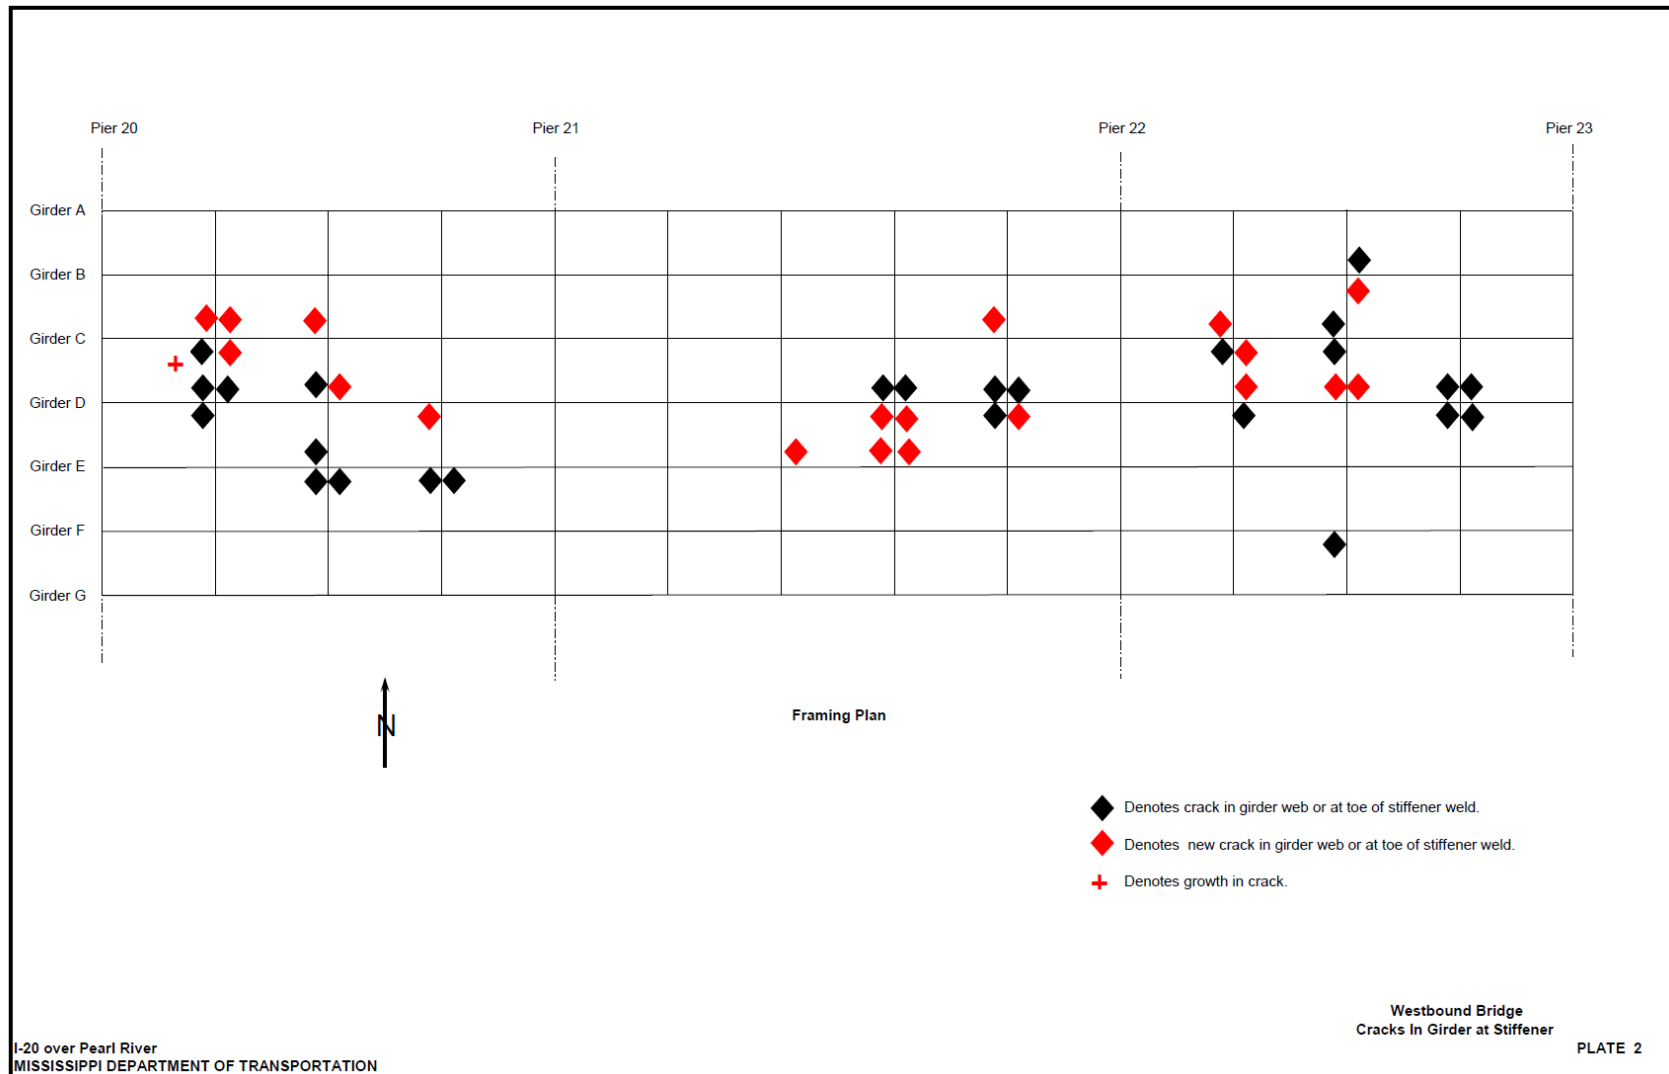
Westbound Bridge Cracks in Girders at Stiffeners
